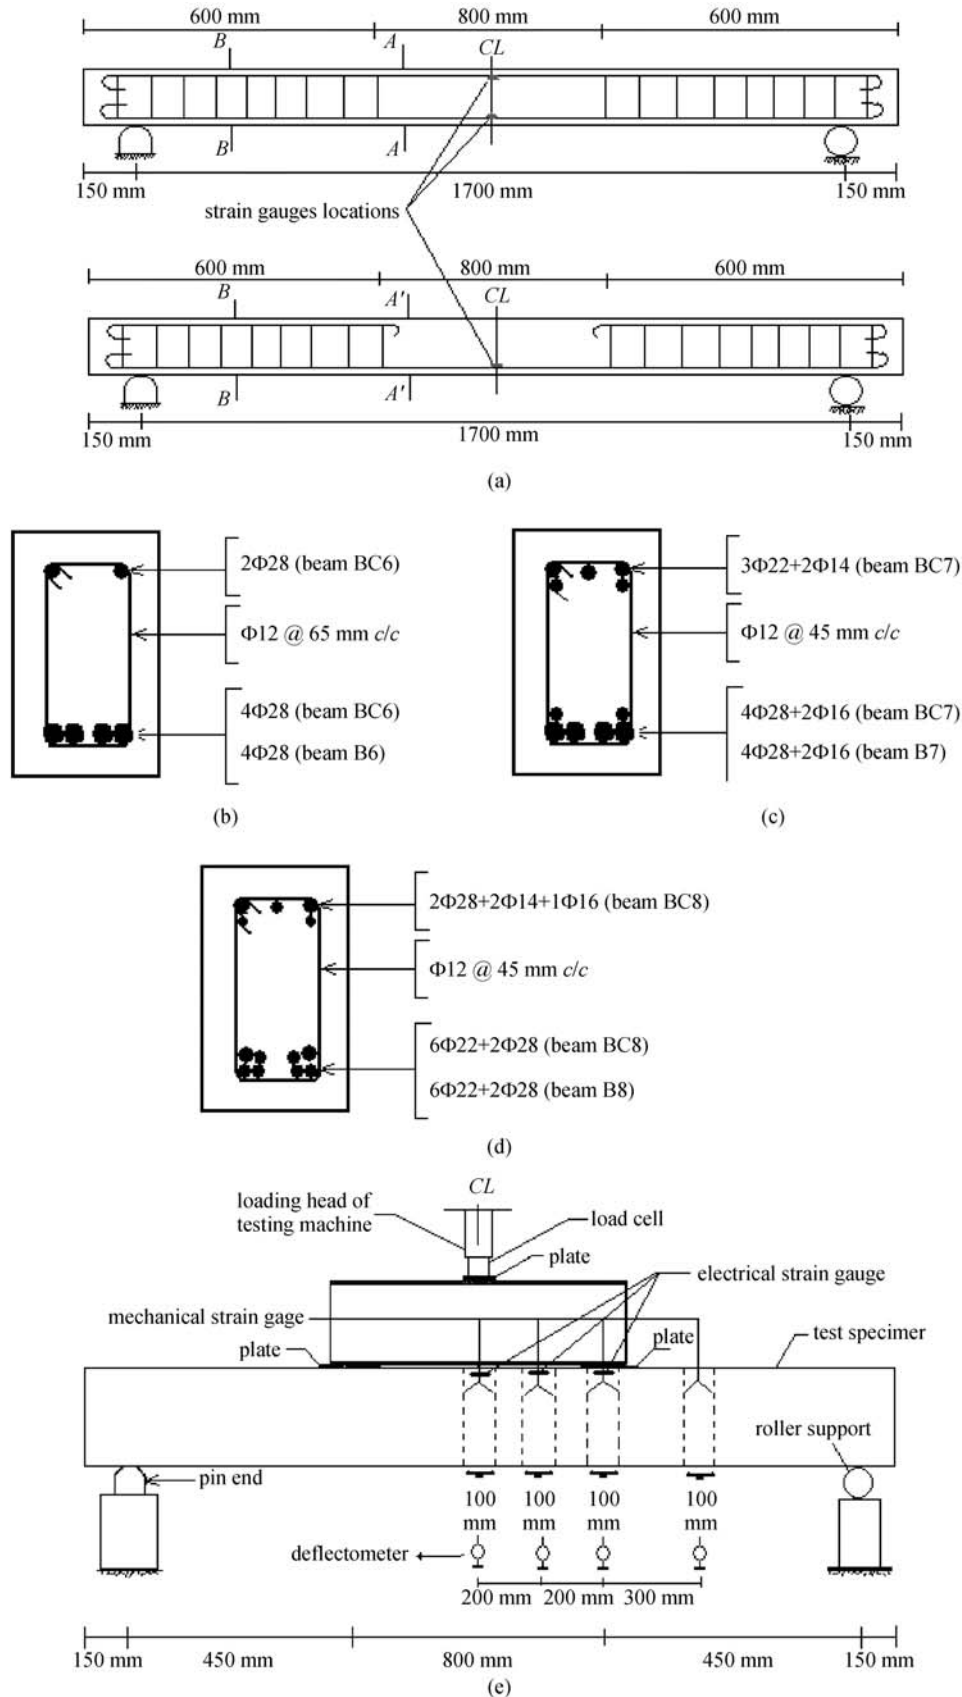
(a) Details of tested beam; (b) details of sections for beams B6 and BC6; (c) details of sections for beams B7 and BC7; (d) details of sections for beams B8 and BC8; (e) testing arrangement
